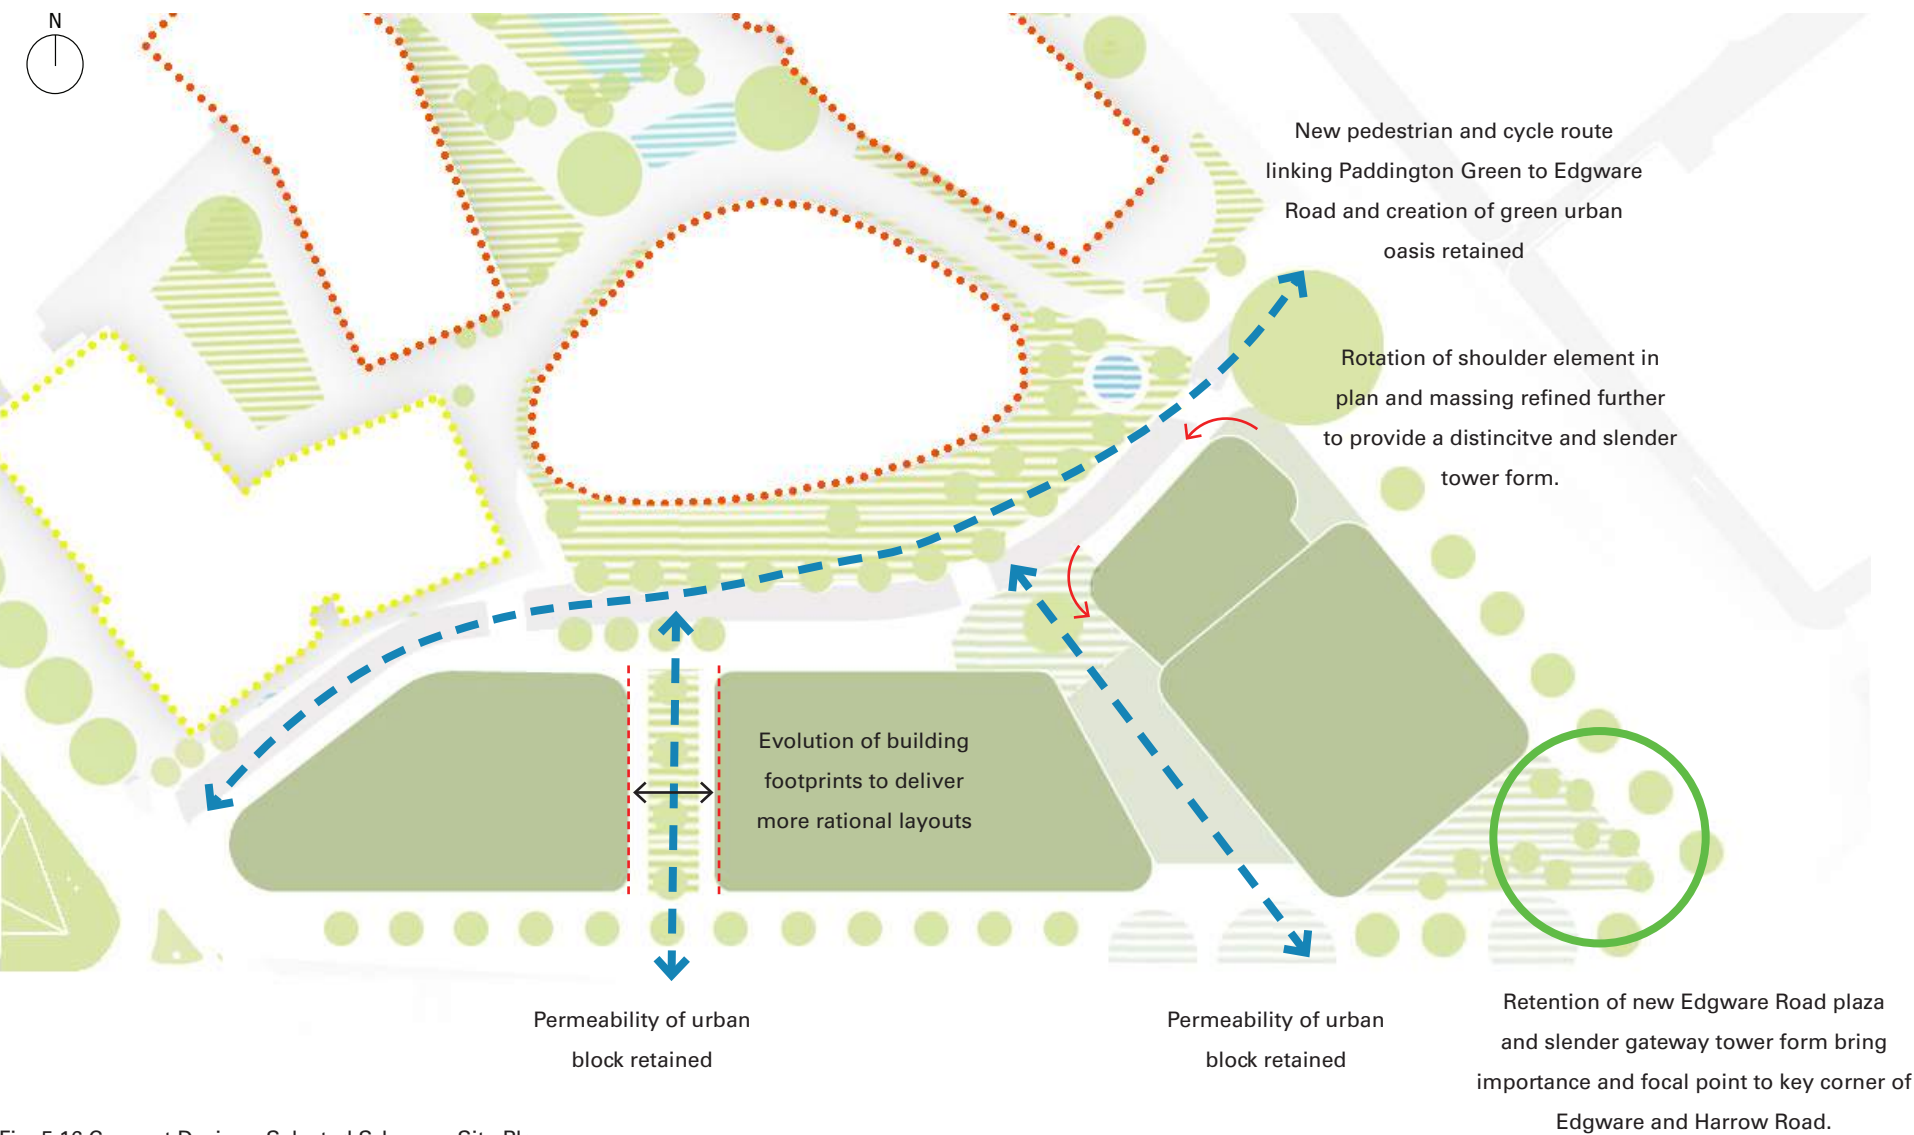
Concept Design - Selected Scheme - Site Plan
